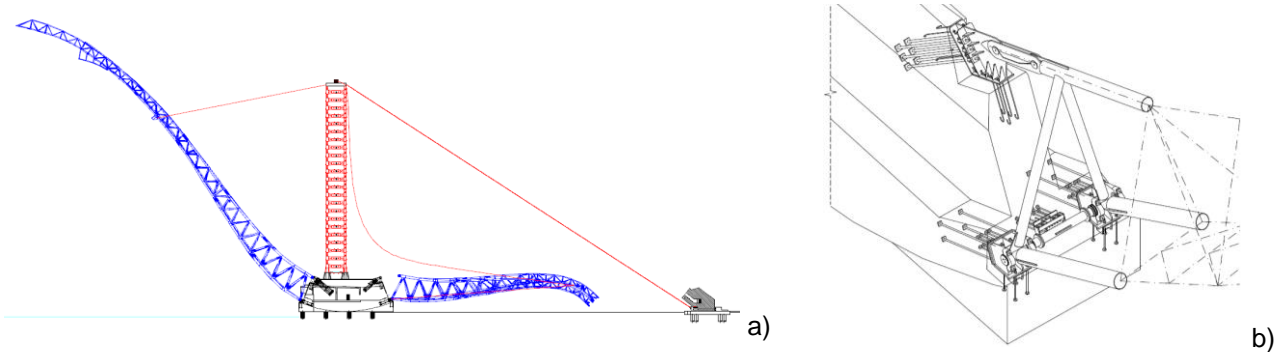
a) Erection procedure of the steel arches, b) 3D model of the arches connection to the piers
